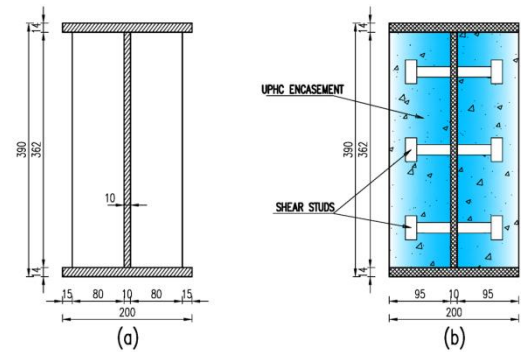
Cross sections of arch ribs: (a) steel section; (b) UHPC encased section
